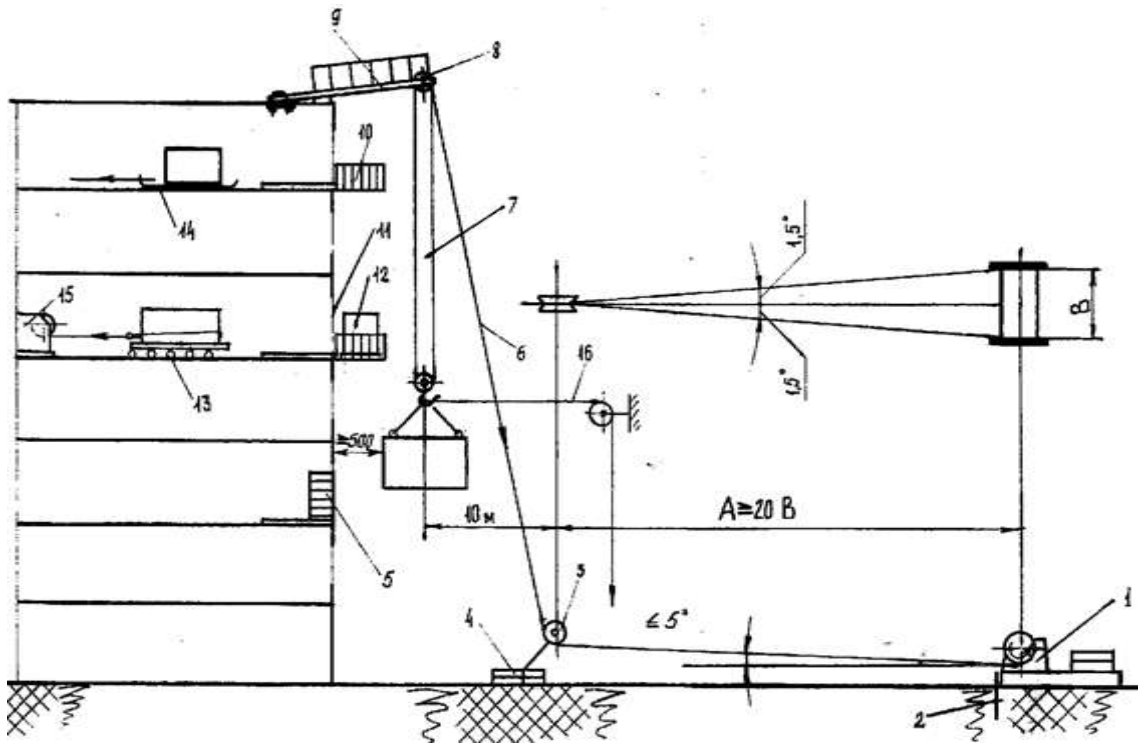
Scheme of the rigging installation: 1 – cargo winch; 2 – fuel-type anchor; 3 – outlet block; 4 – ground (ballast) type anchor; 5 – cargo receiving platform in a raised (non-working) state; 6 – descending branch of cargo rope; 7 – freight hoist; 8 – fixed block; 9 – cantilever boom; 10 – loading platform in lowered (working) condition; 11 – mounting slot; 12 – wattle at the cargo receiving platform; 13 – skating rinks; 14 – steel sheet; 15 – manual winch; 16 - brace.
